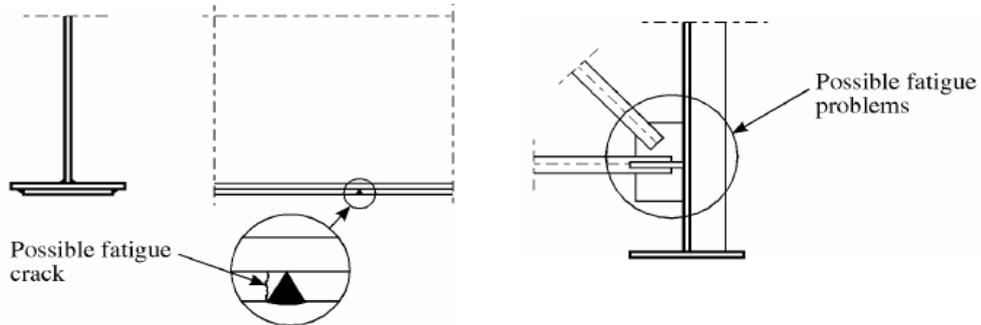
Fatigue Problems in Welded Steel Members
